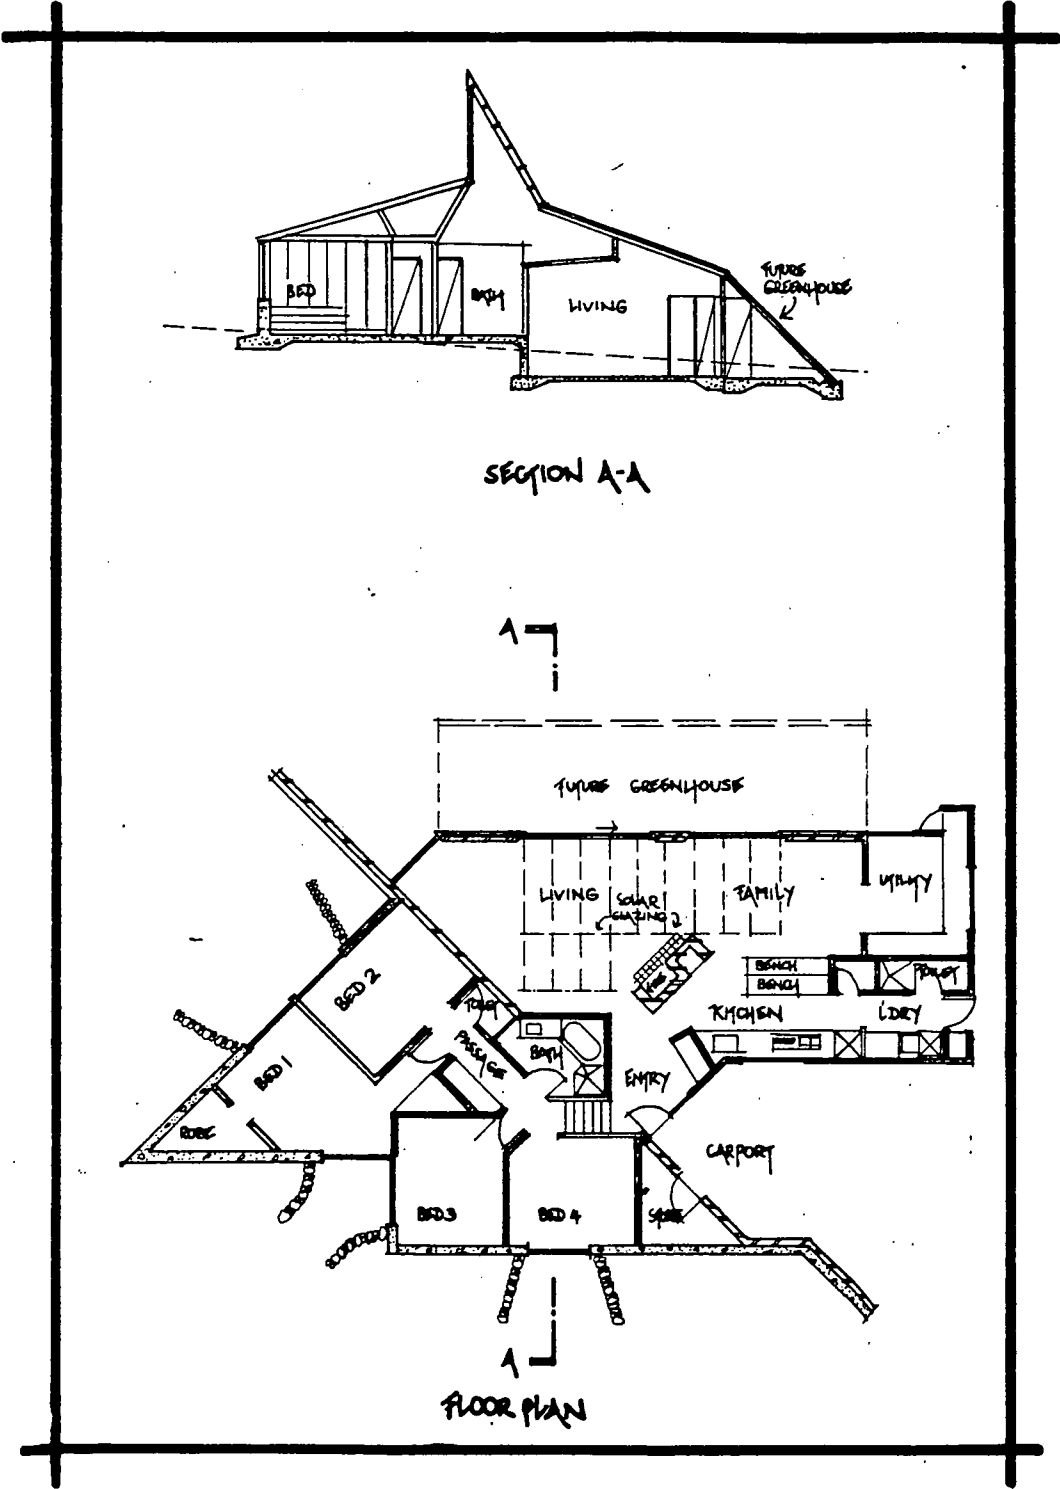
Field House, Merseylea. Floor plan and section drawing. Source: A.G.Walsh
